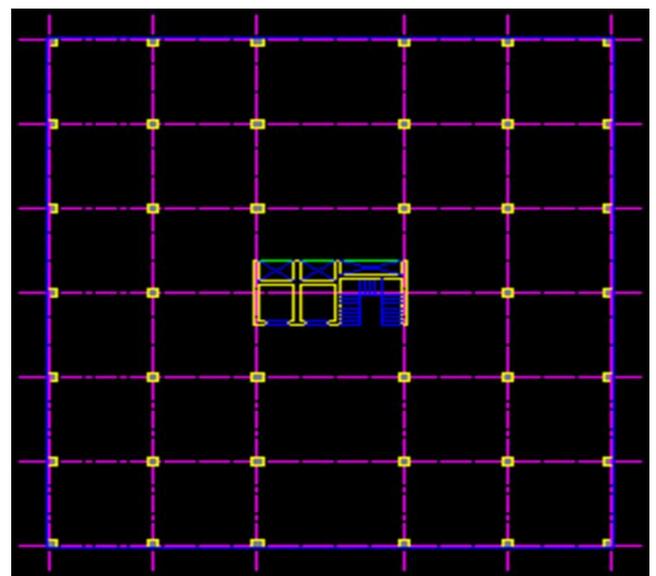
Plan of a G+20 storey building with dimensions 32.65mx36.3m
